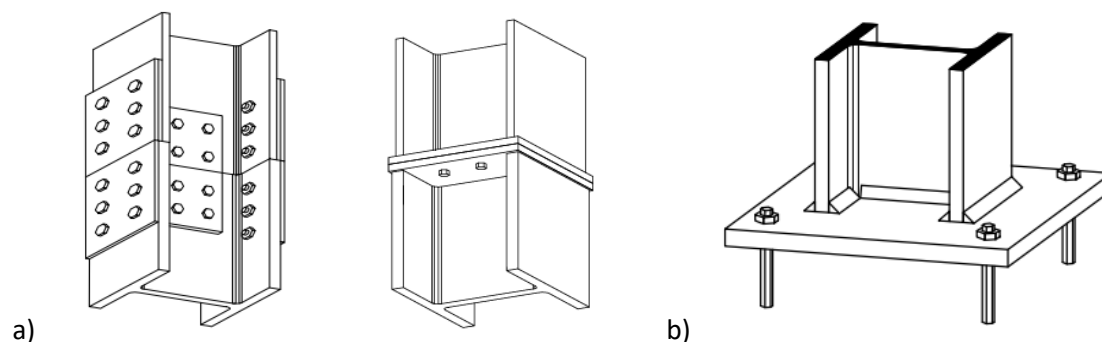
Beam and column splice joints (a) and base plate connection (b) [43].
